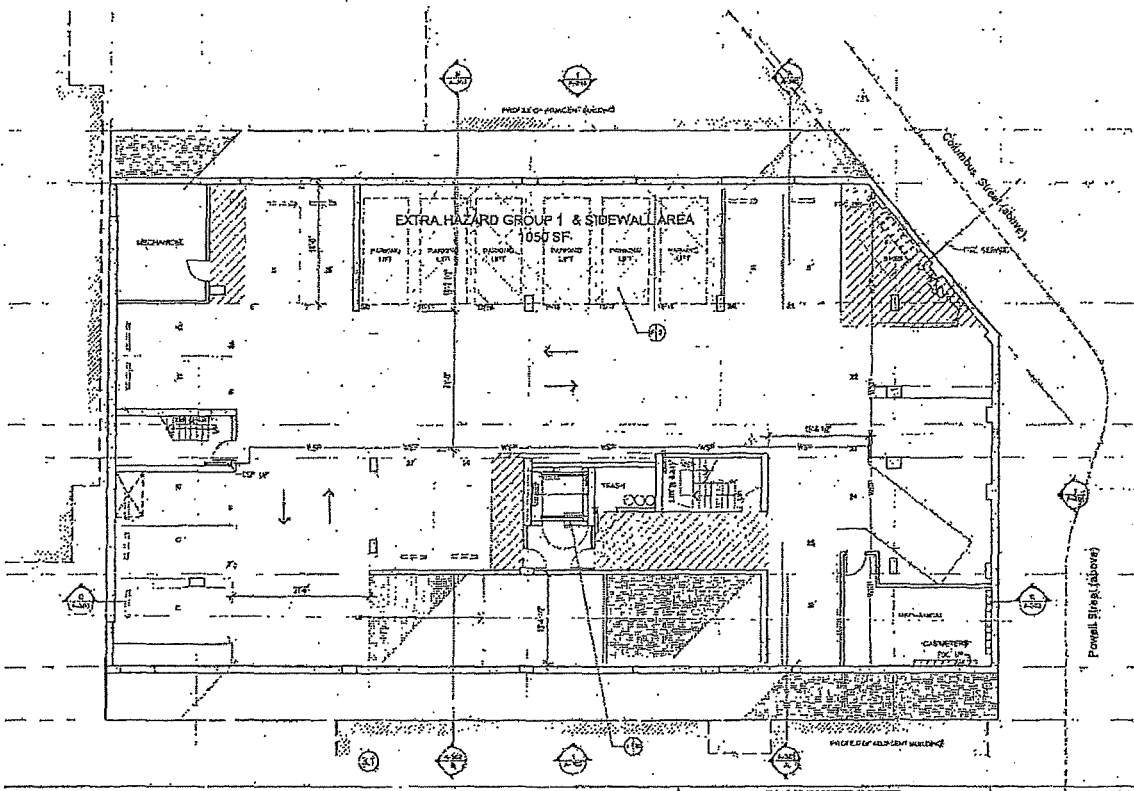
PROPOSED 1731 POWELL ST BASEMENT LEVEL PLAN
